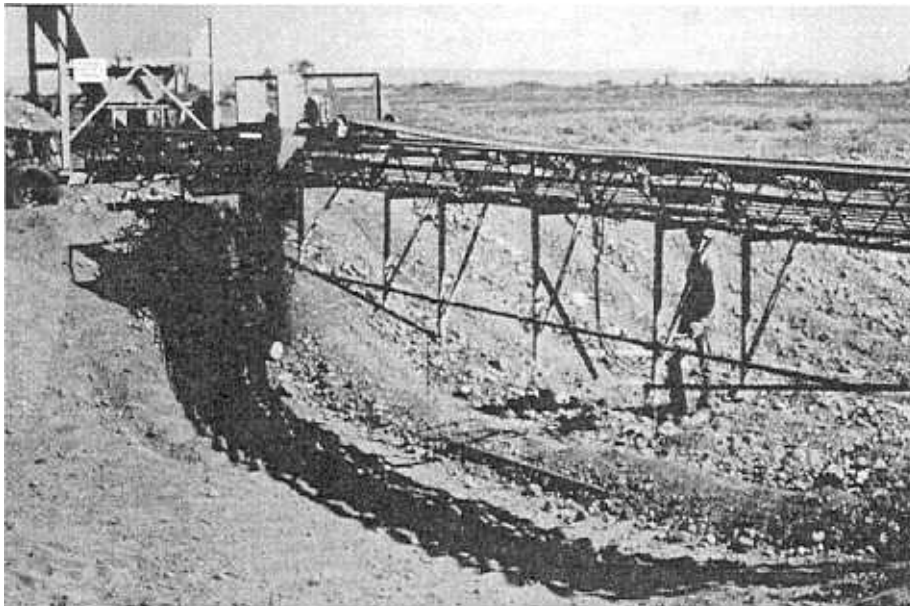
View of conveyor system used to place sand/gravel cover. Material is placed in a windrow fashion and will have to be dragged in to finish condition as shown on figure 39.
